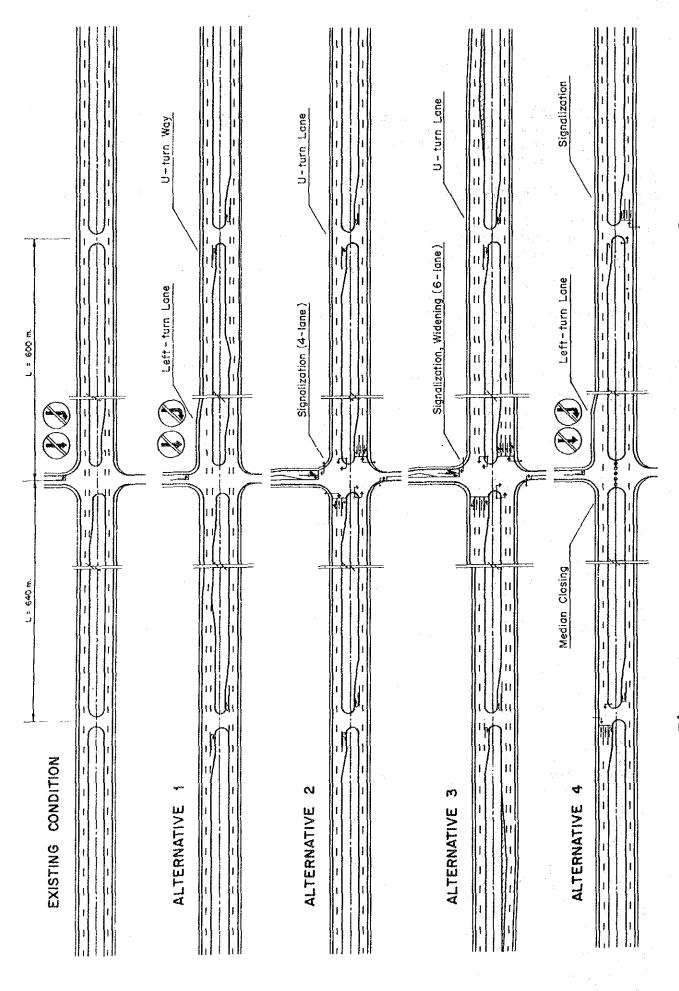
ALTERNATIVES OF IMPROVEMENT PLAN FOR 8-15
